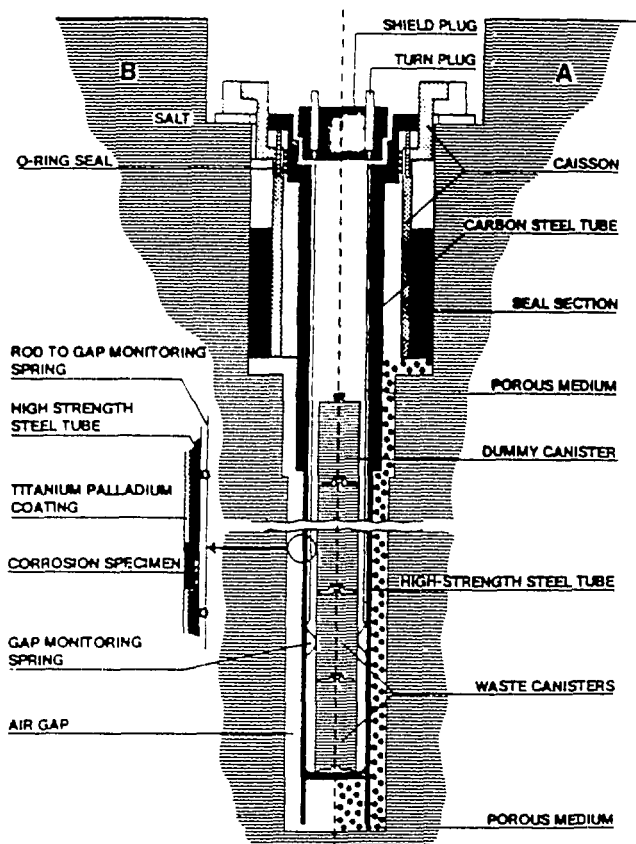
The HAW underground demonstration facility (GSF). Cross-section through typical deposition holes drilled in the salt. (Note that all canisters are retrievable.)
